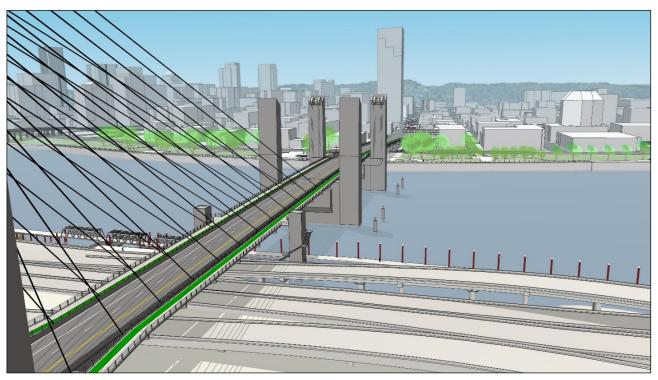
Span Combination 4 (girder west approach, vertical lift central span, cable supported east approach), artist's rendering, view looking southwest (Fat Pencil Studio, 2021).
